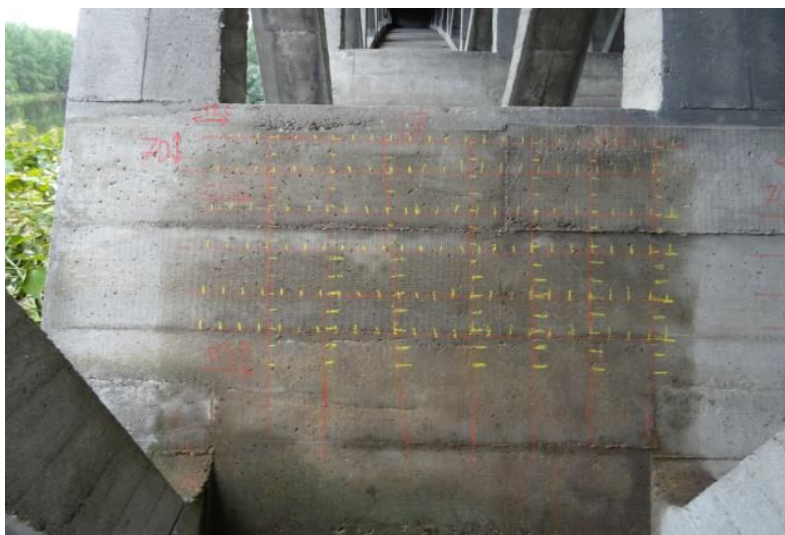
Bracing wall n°2 at the base of the inclined struts – South side
